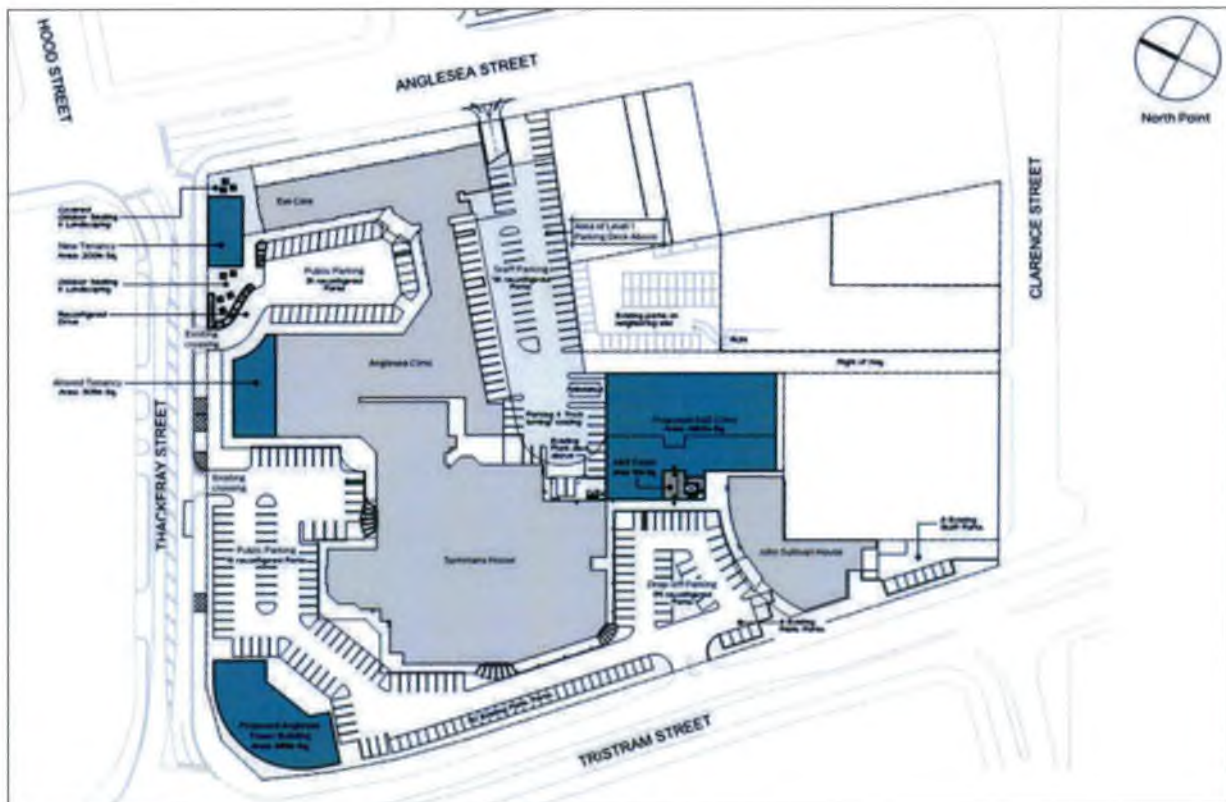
Proposed Development: Anglesea Medical Centre, Hamilton
